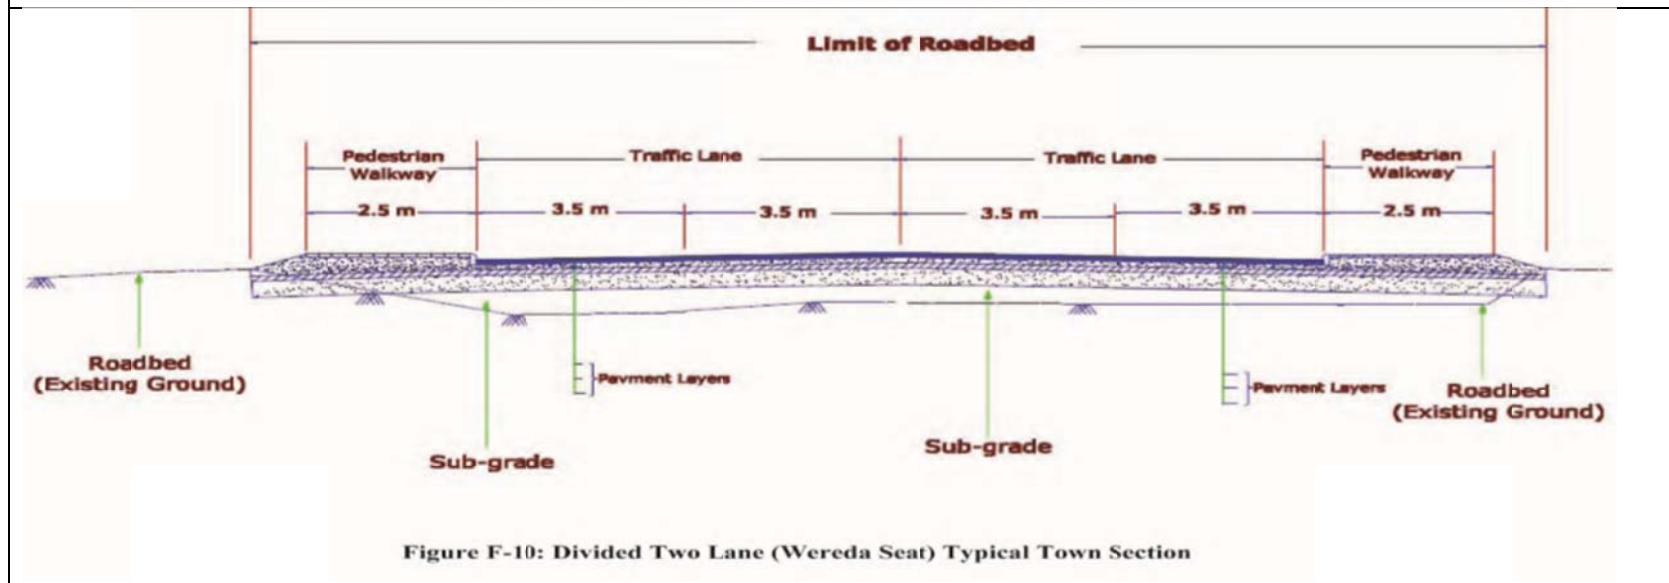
Divided Two Lane (Wereda Seat) Typical Town Section
